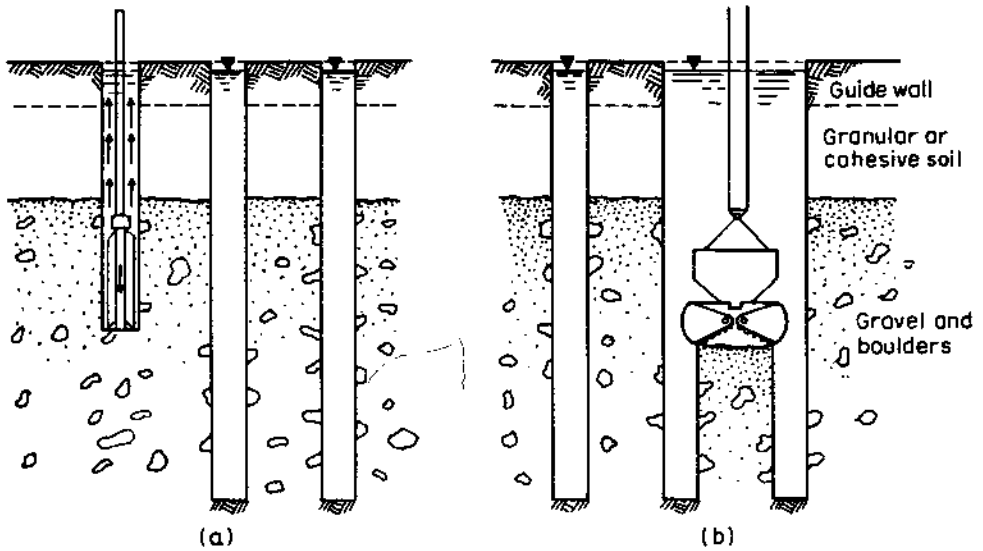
Two stage panel excavation with percussive tools and clamshell grab: a) excavation of pilot holes with percussive tools; b) panel excavation with clamshell bucket (Xanthakos 1979).
